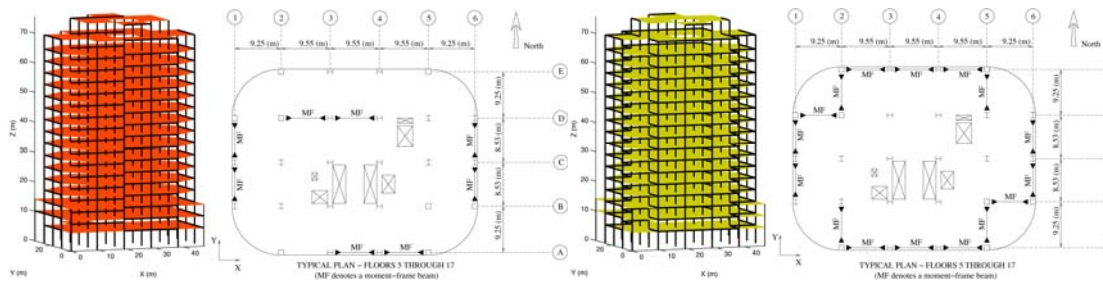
FRAME3D models of two steel moment frame buildings – an existing building designed using the 1982 UBC and a redesigned building designed using the 1997 UBC, and typical plan views showing the
